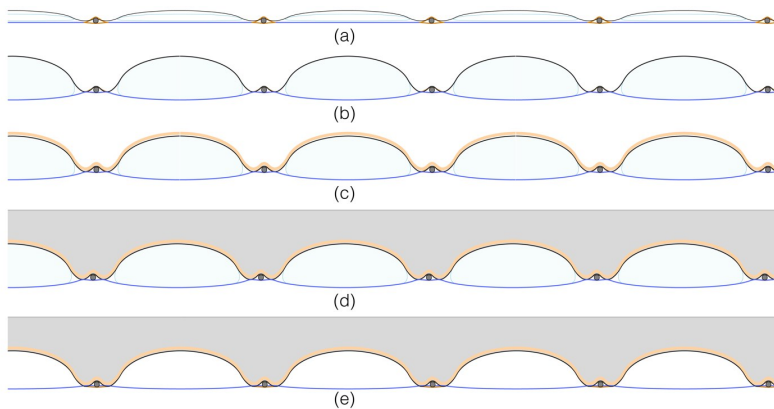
Principle diagram of inflation and building up strength in layers for the Knit-Candela textile: (a) custom knitted textile with pockets for cables and balloons; (b) pockets inflated using standard modelling balloons; (c) fast-setting cement-paste coating is applied to the textile; (d) concrete is cast onto the stiffened textile; (e) balloons can be deflated and form the cavities of the concrete structure.
